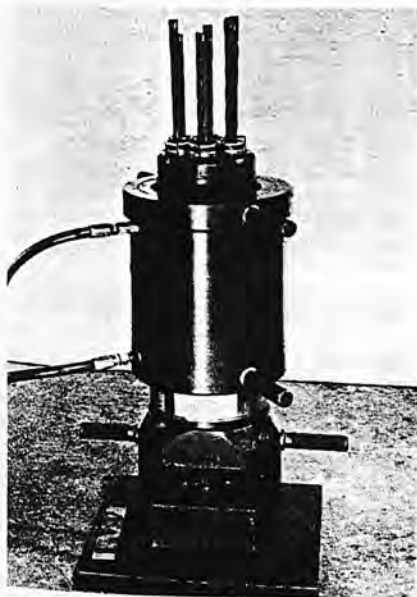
Typical jacks for tensioning rock anchors; (c) (below) depicts a hollow ram multi-strand stressing jack (photo, courtesy, Ground Anchors Ltd.)
